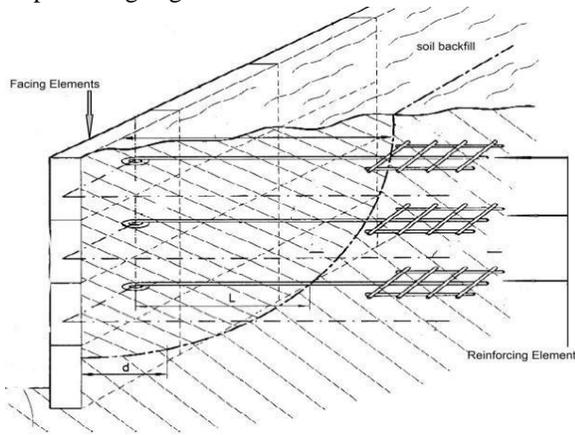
Basic arrangement of reinforced soil wall with reinforcing element
